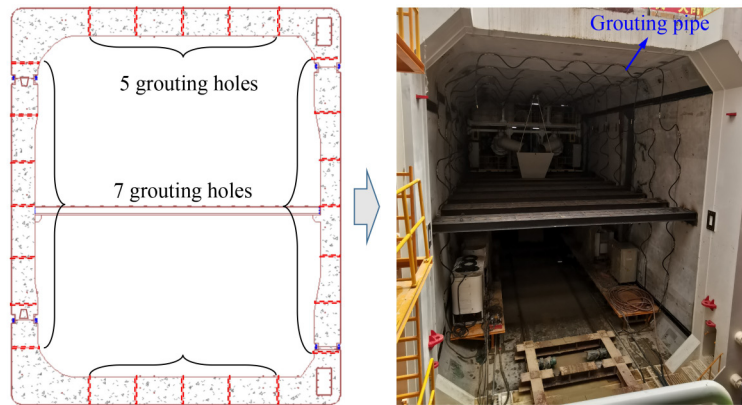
Layout of friction-reducing slurry injection holes around the ring segments.
